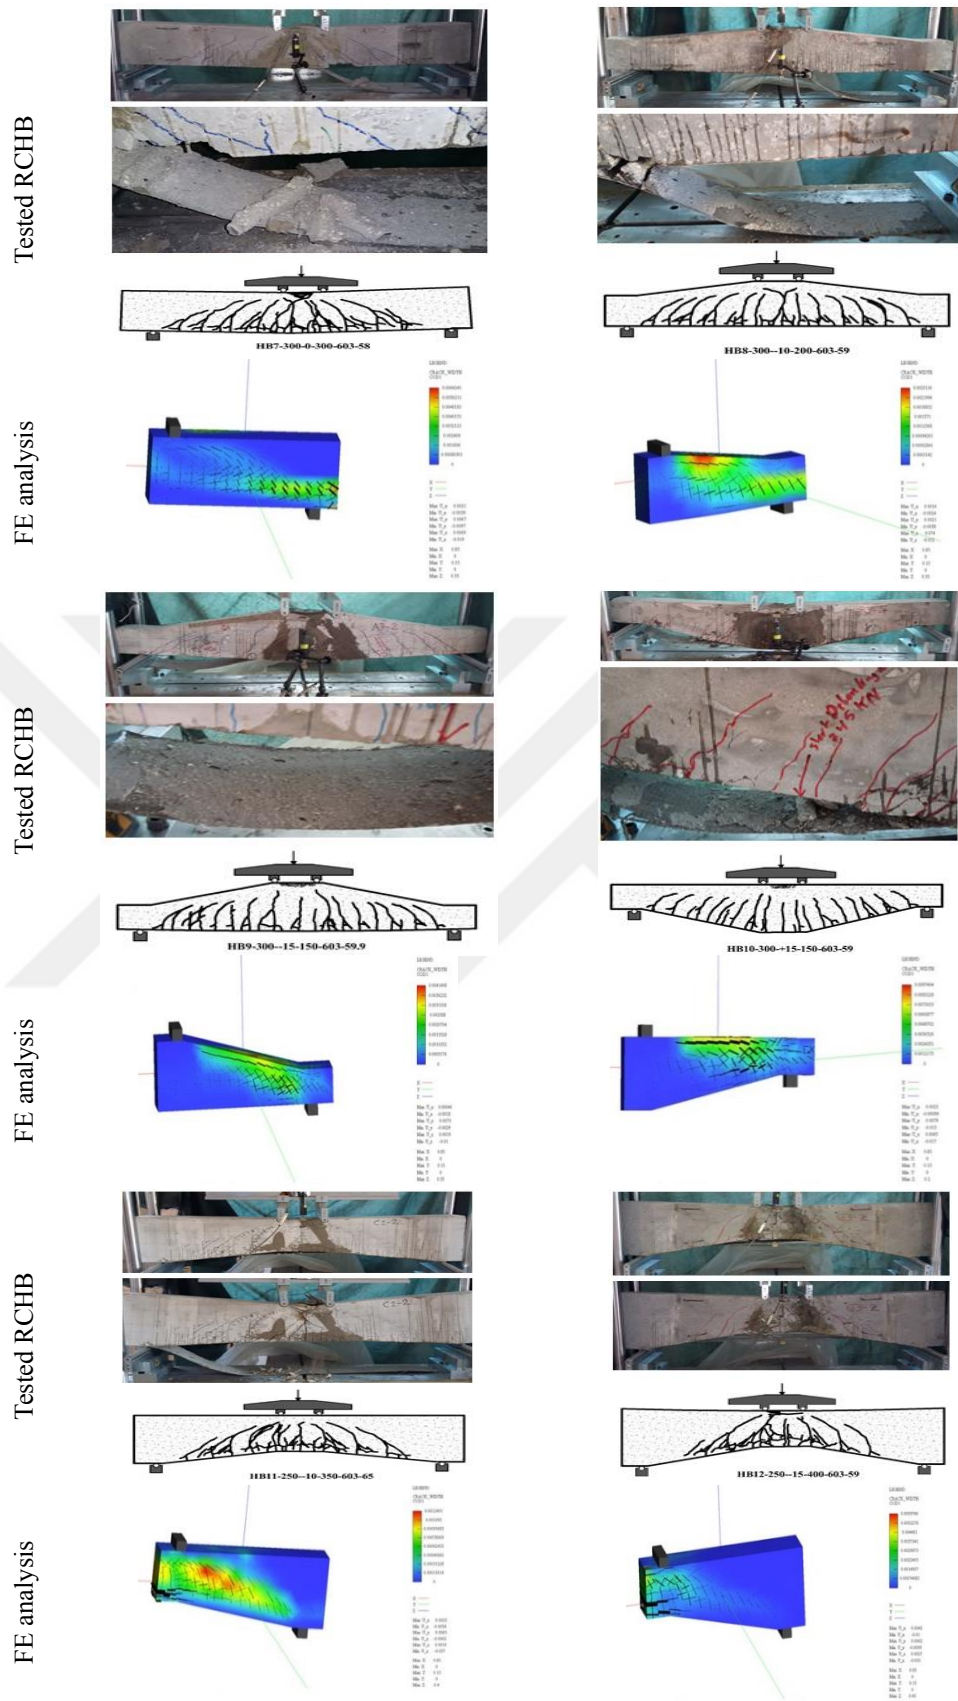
Cracks pattern with the mode of failure of testing haunched beams HB7-HB12 with relevant strengthening FE analysis cracks
